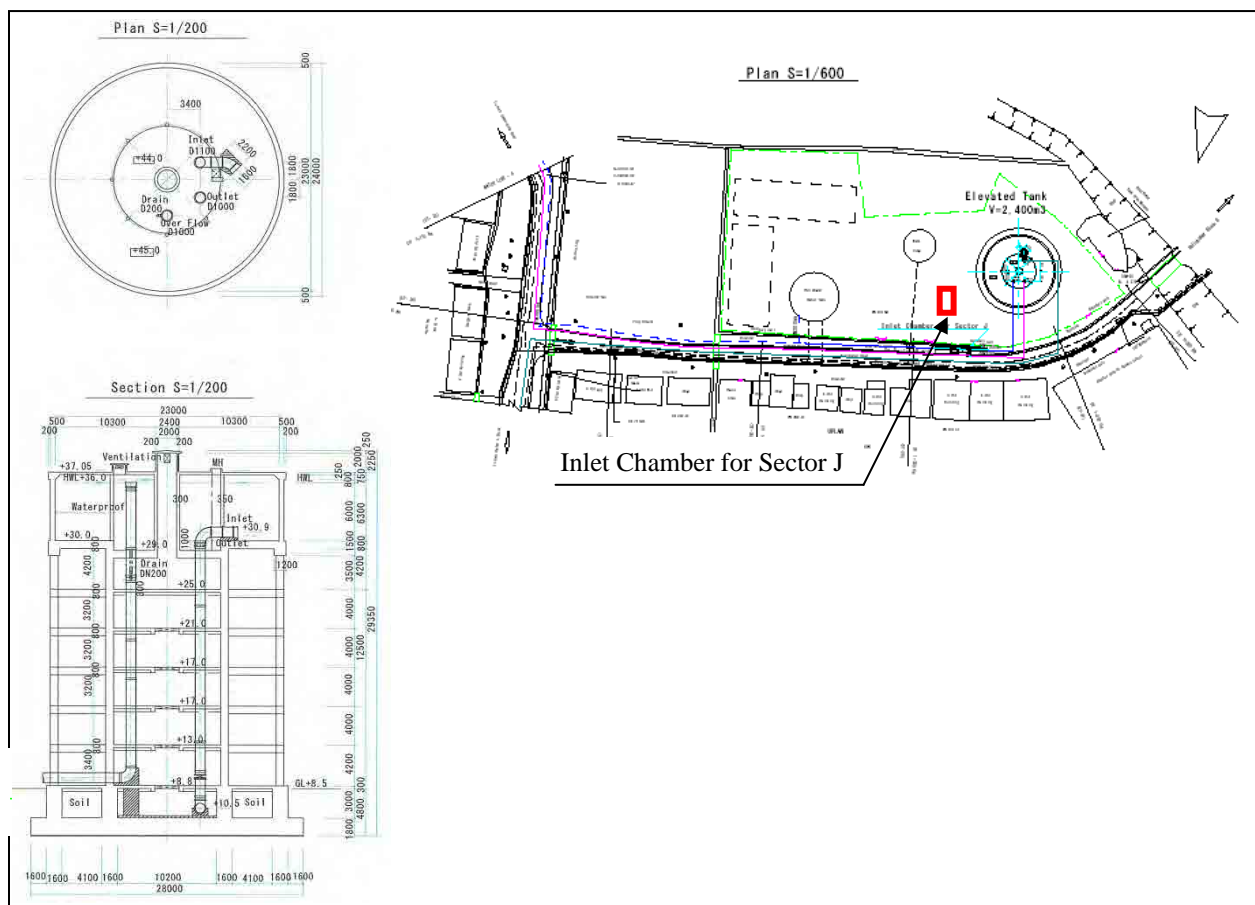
General Layout Plan of Halishahar Elevated Tank
